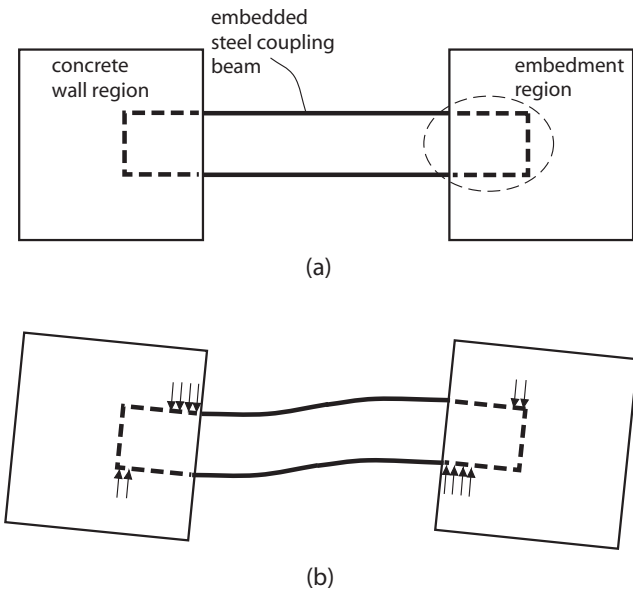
Hybrid coupled wall subassembly with embedded beam: (a) undeformed configuration; (b) deformed configuration
